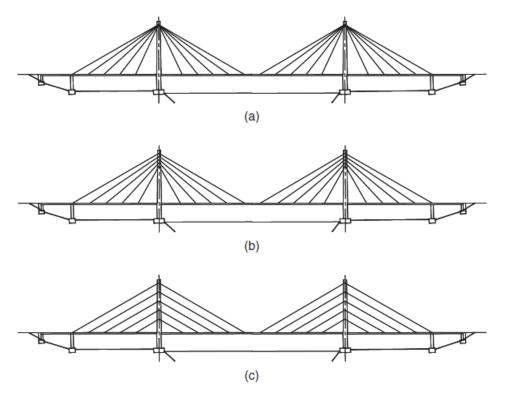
Alternative stay cable arrangements: a) fan stay system; b) semi-fan stay system; c) harp stay system (Parke and Hewson, 2015)
